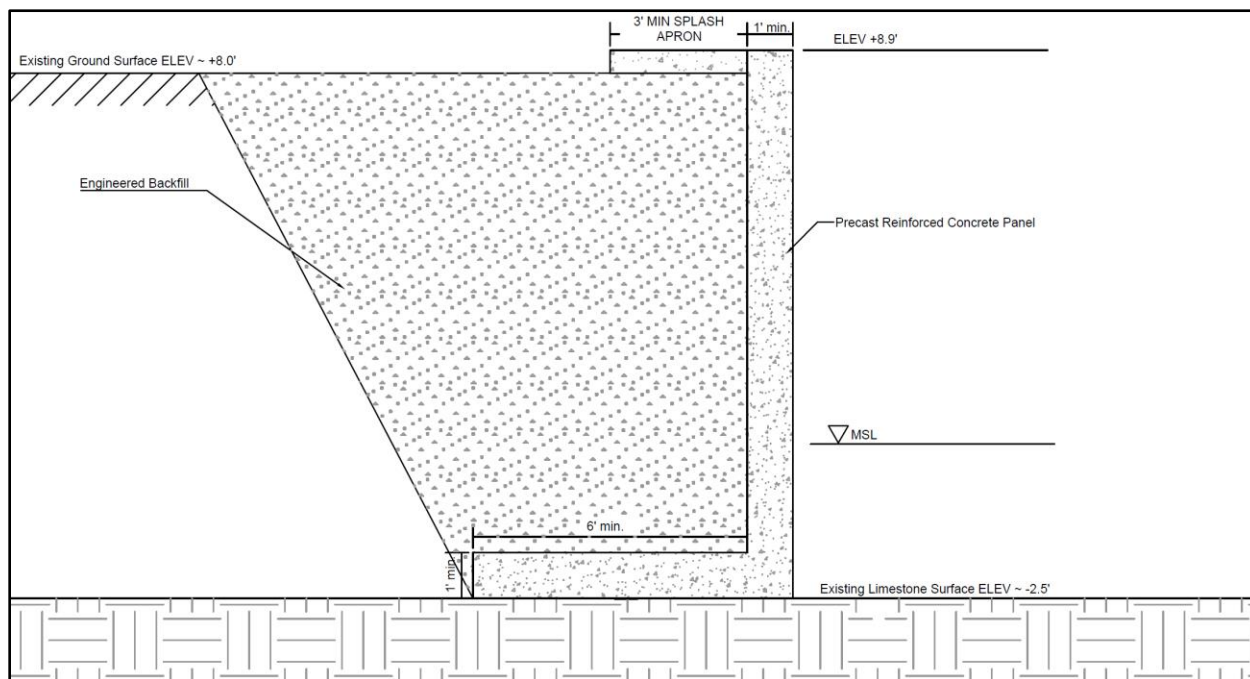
Typical Detail of a Precast Concrete Panel Wall
